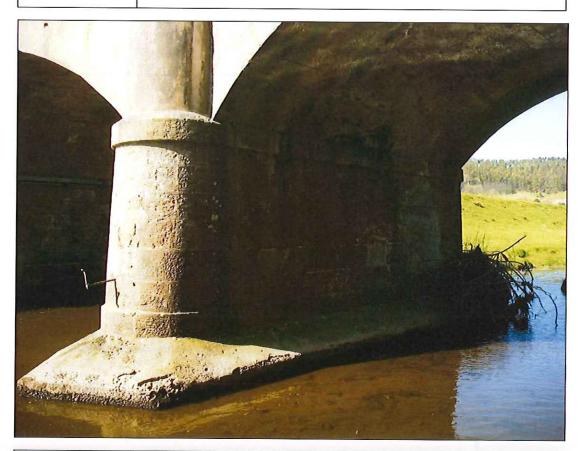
North abutment. Widened mass concrete section of abutment is at left hand end of arch in picture.
